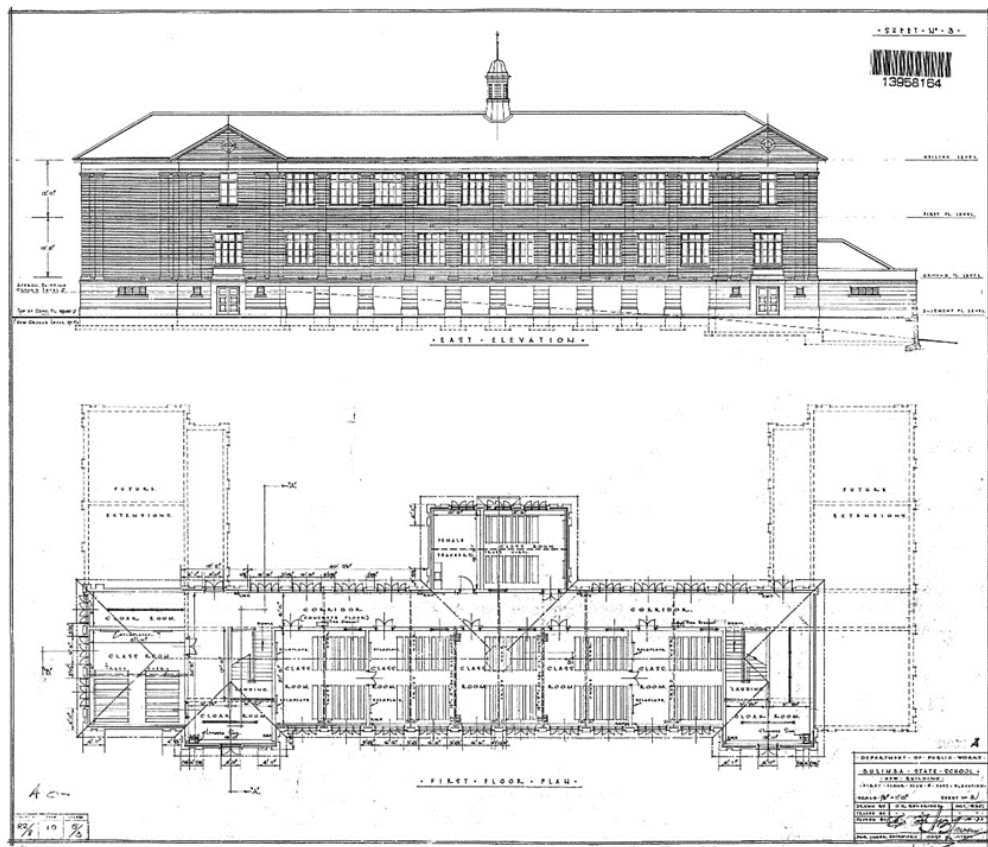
Bulimba State School, New Building, East Elevation and First Floor Level
